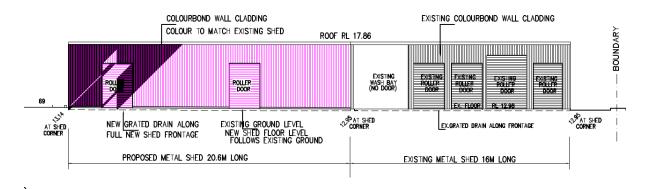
Western elevation of the proposed development (source: Majcon, dated 18/12/2020).
